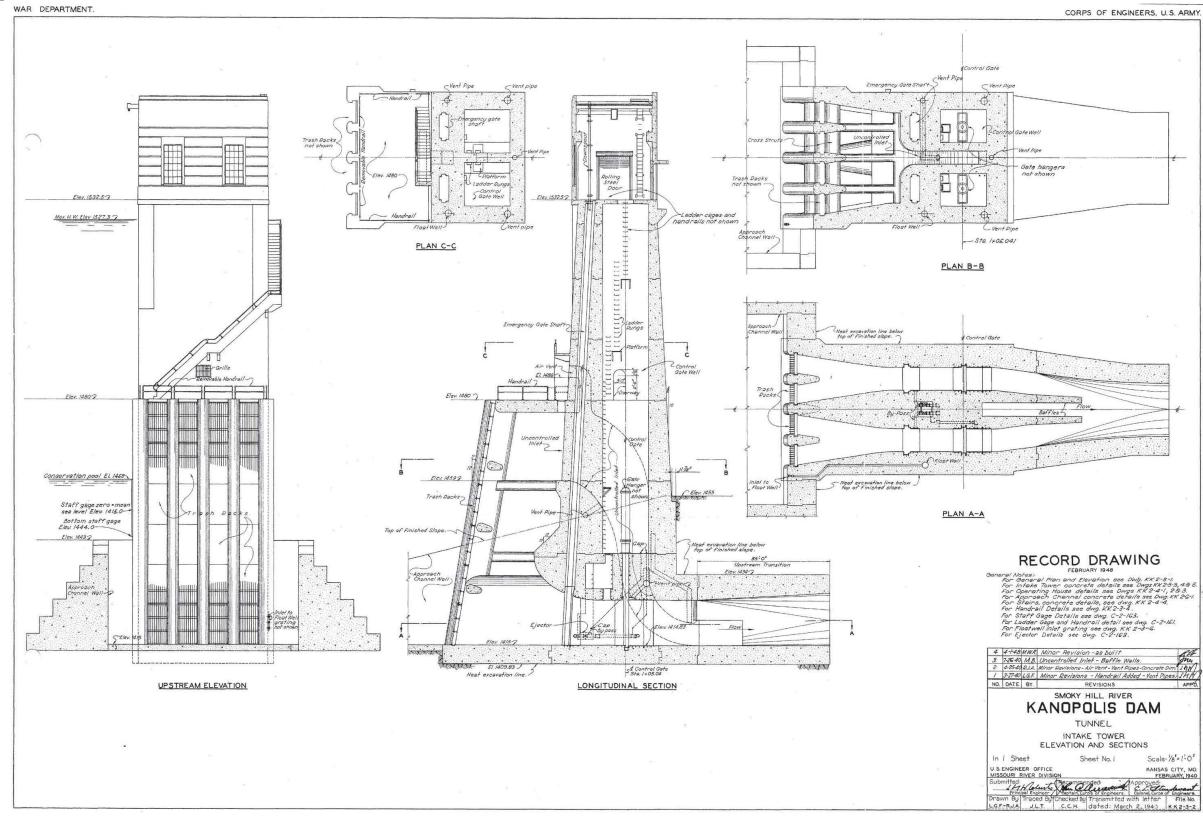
Intake tower, elevation and sections. Elevations in NVDG29.
